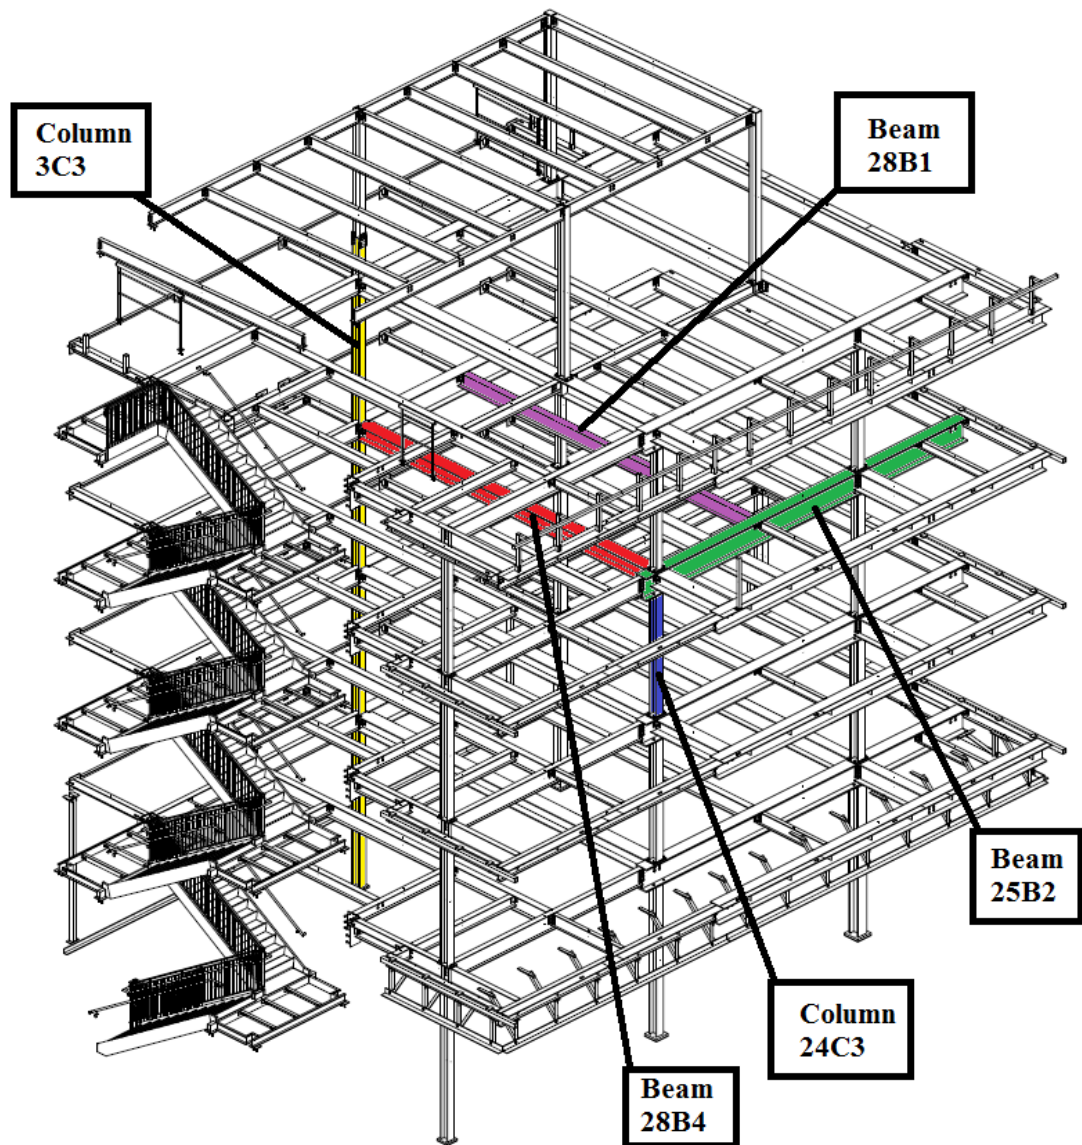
Isometric view of instrumented building with labeled structural steel members (Adapted from R.C. Fabricators Inc.)
